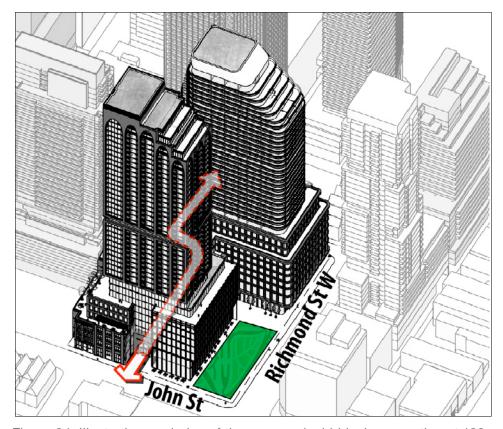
Illustrative rendering of the proposed mid-block connection at 126 John Street
